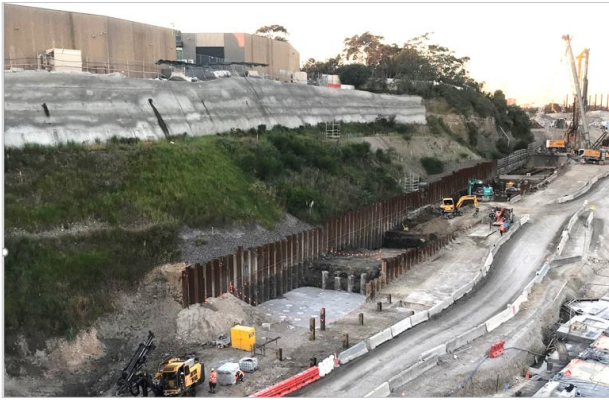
Shale quarry fill and rock batter and sheet pile wall installed along the back of RSW. Photo was taken during construction of the pile-slab foundation that supports the RSW.
